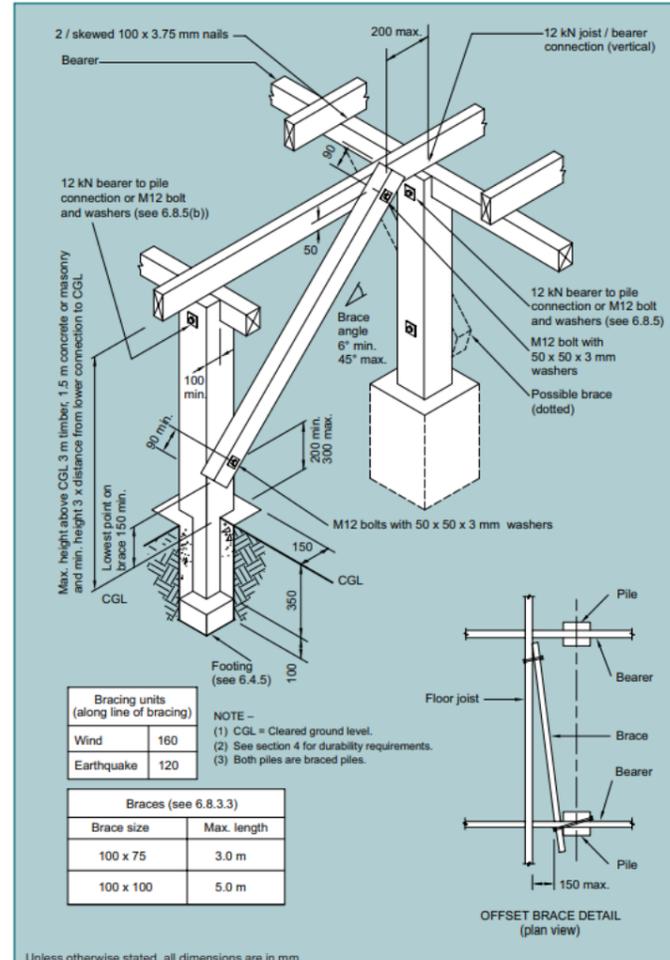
Braced pile system – Brace connected to joist (see 6.8)
